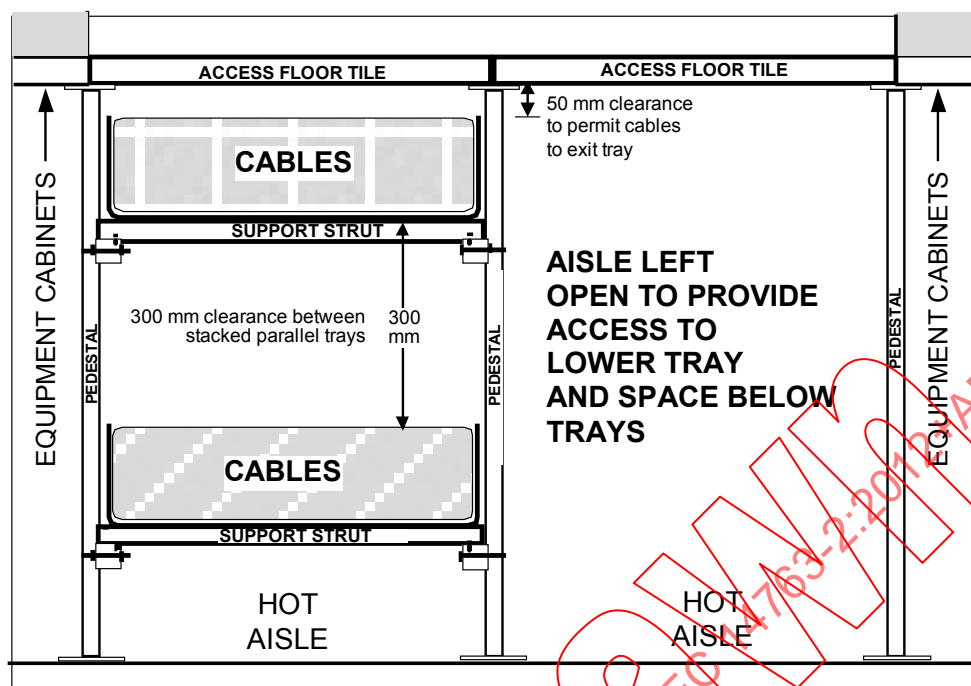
Example of uncovered (accessible) row of floor tiles to provide access to lower tray
